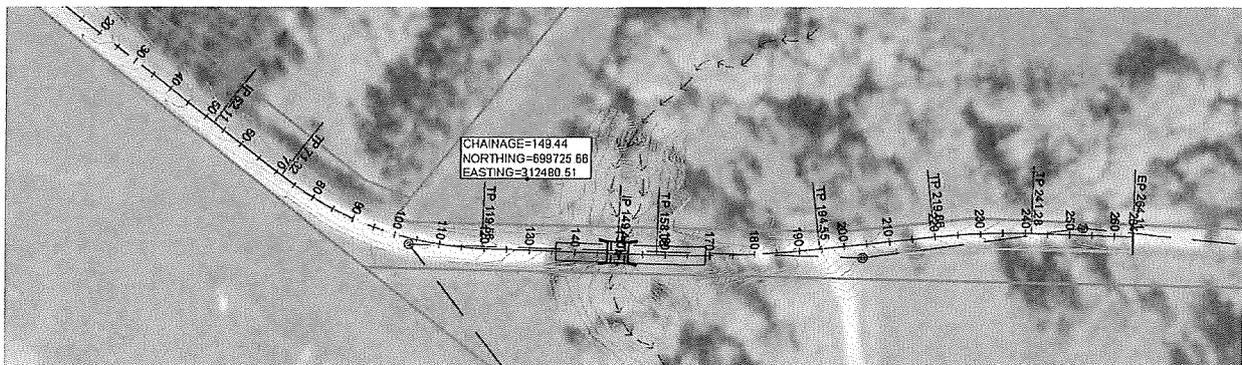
Aerial view of Brookfield Road Bridge and Alignment
